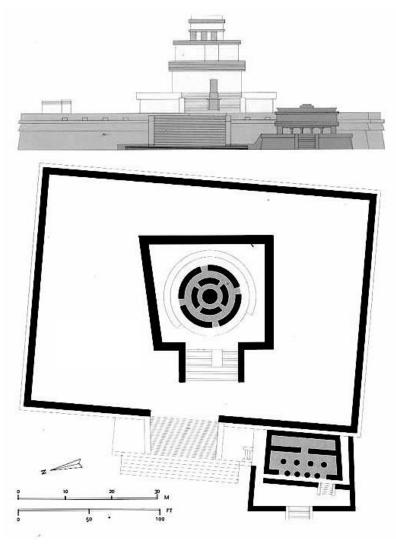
Section and Plan of Caracol, Chichén Itzá (Ruppert 1935: 318)
